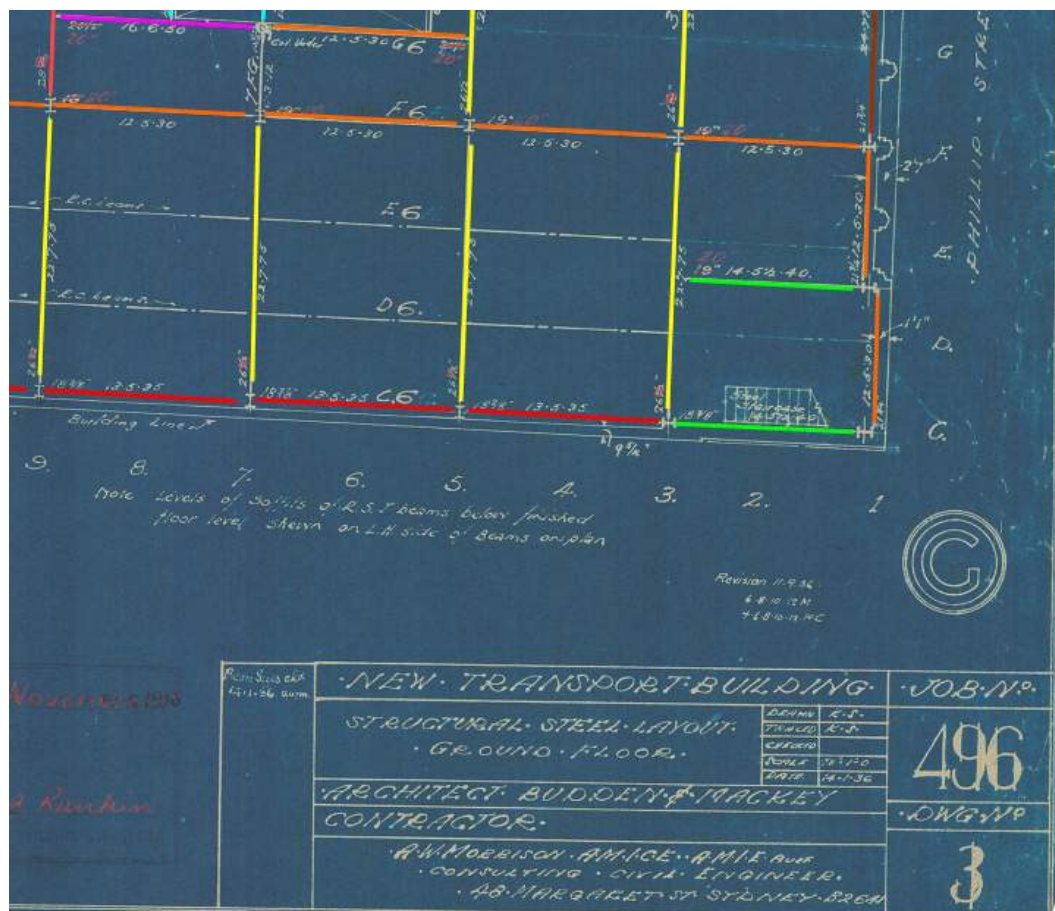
Structural drawing no. 3 with beam sizes highlighted. TB3 is green at Grid E-D/1-3
